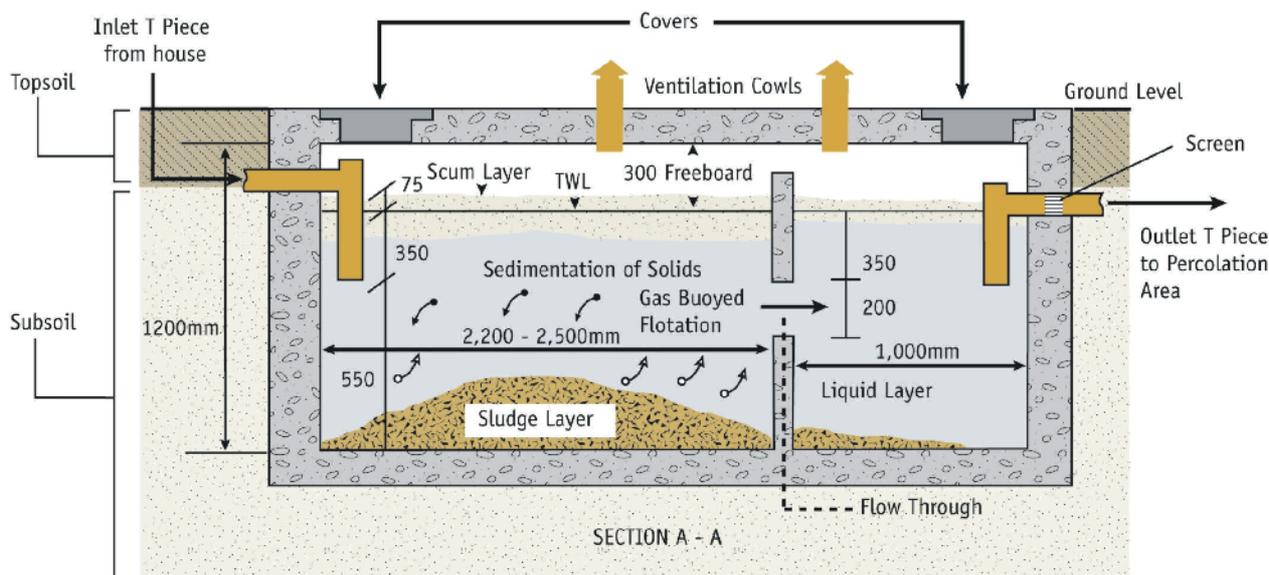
LONGITUDINAL SECTION OF A TYPICAL SEPTIC TANK (ALL DIMENSIONS IN MM).
